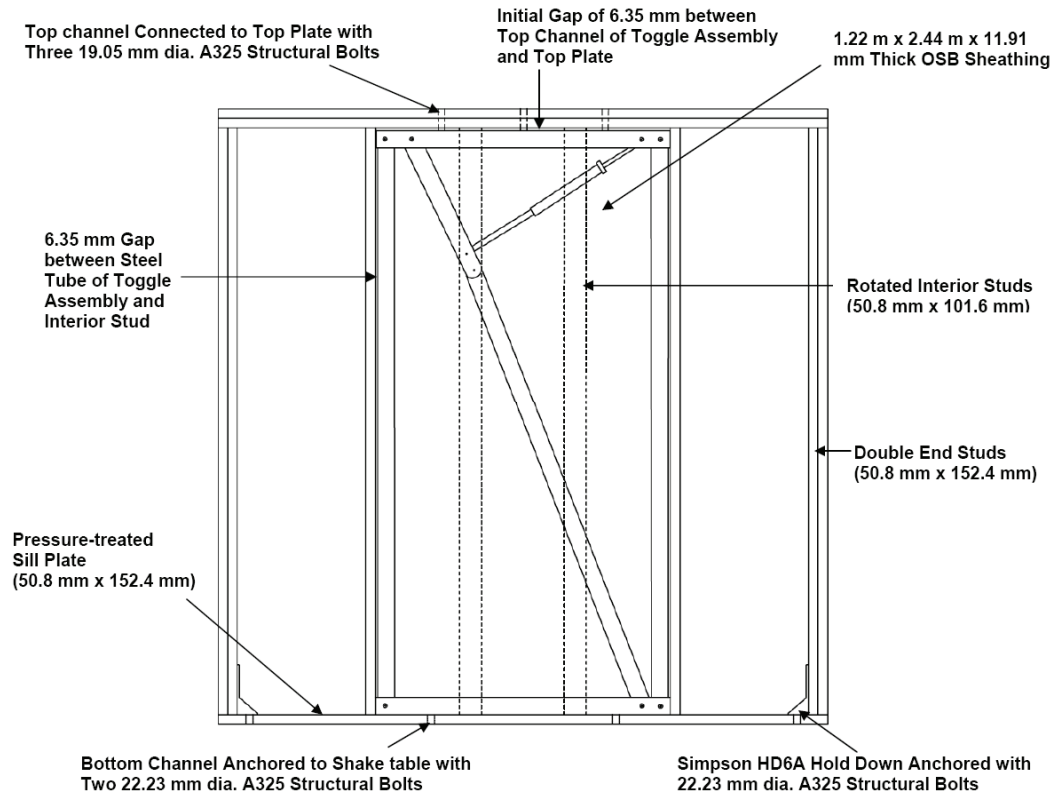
Details of Retrofitted Woodframed Shearwall
